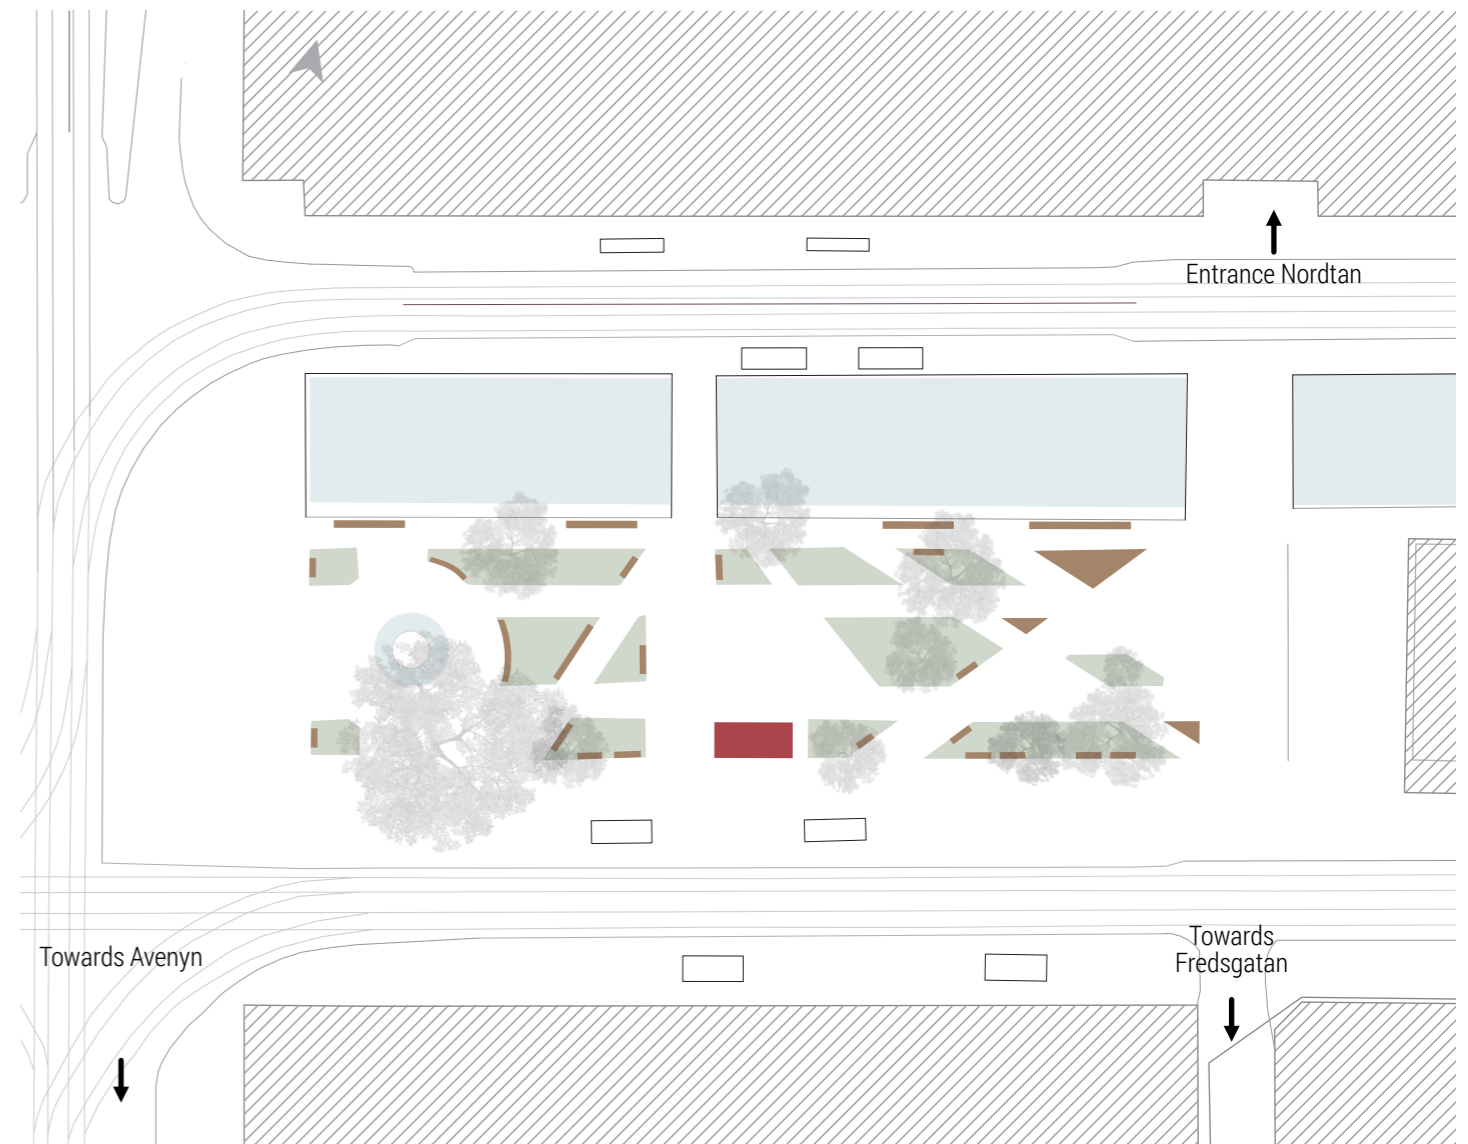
Site plan of Brunnsparken, Gothenburg. Scale 1:700.
